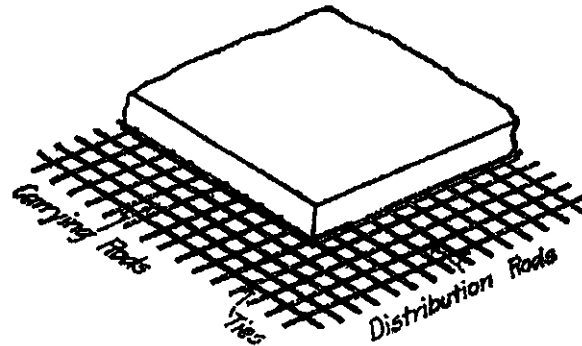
Monier trellis. Illustration from Homer Reid, *Concrete and Reinforced Concrete Construction* (New York: Myron C. Clark, 1907).
